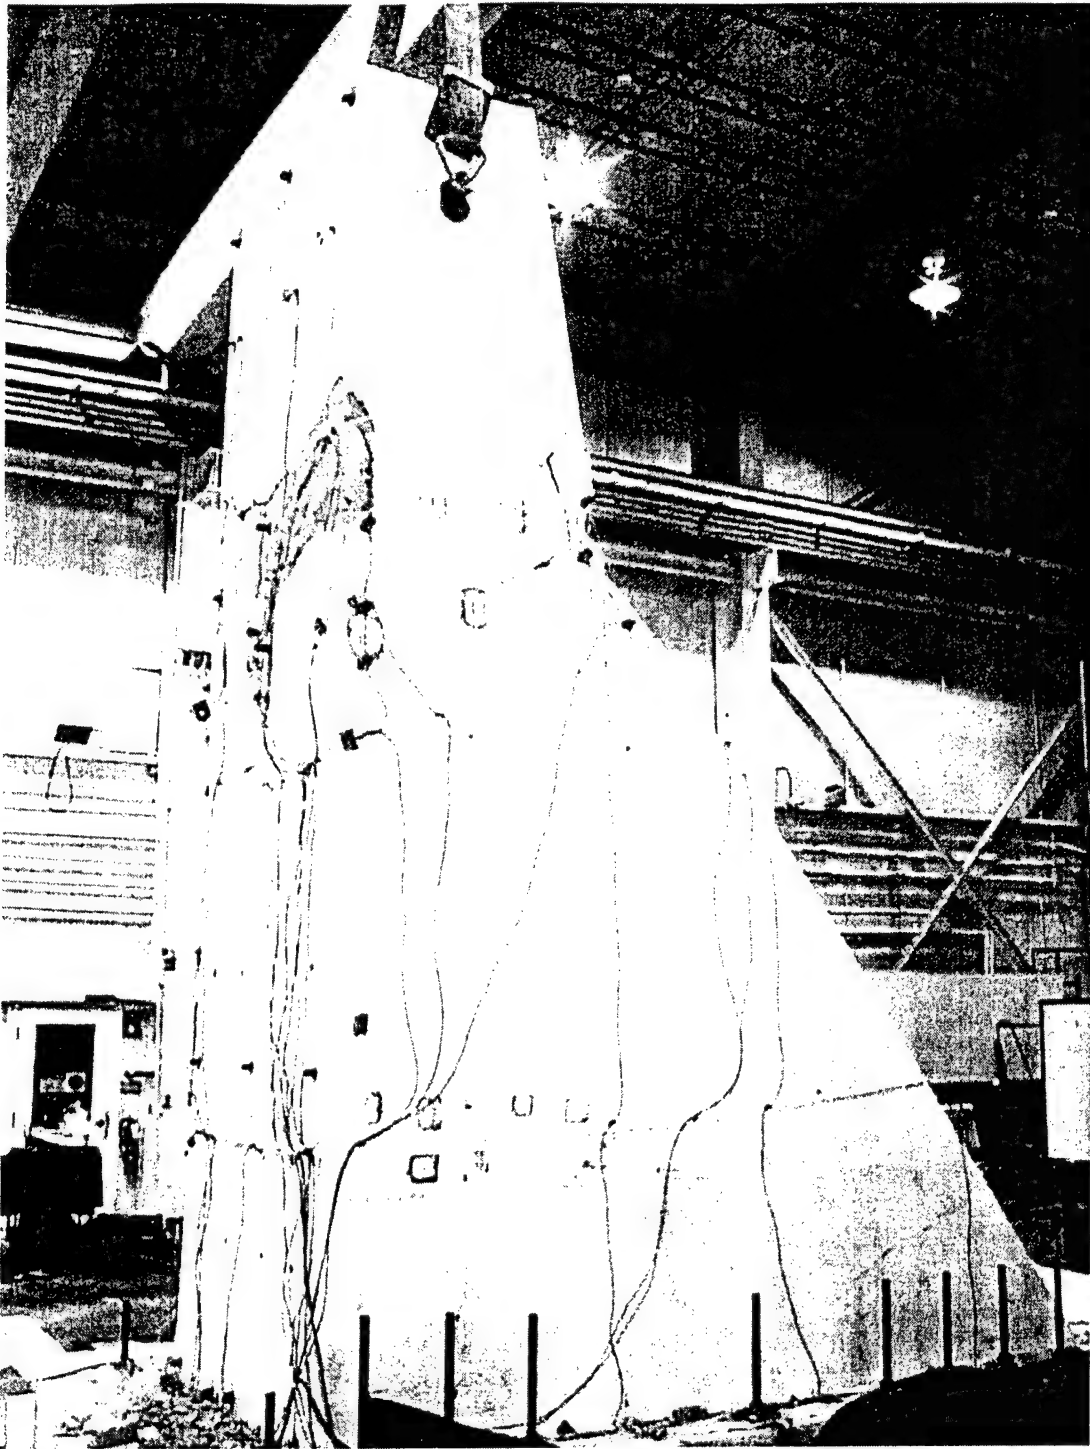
Overall front face view of the dam model after failure in the Sine6 test.
